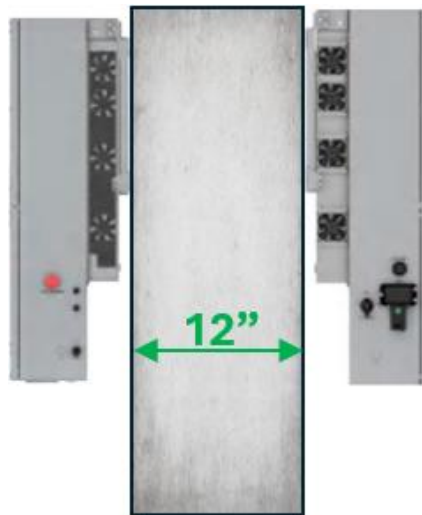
Minimum wall width requirement for a wall with multiple inverters on opposite sides
